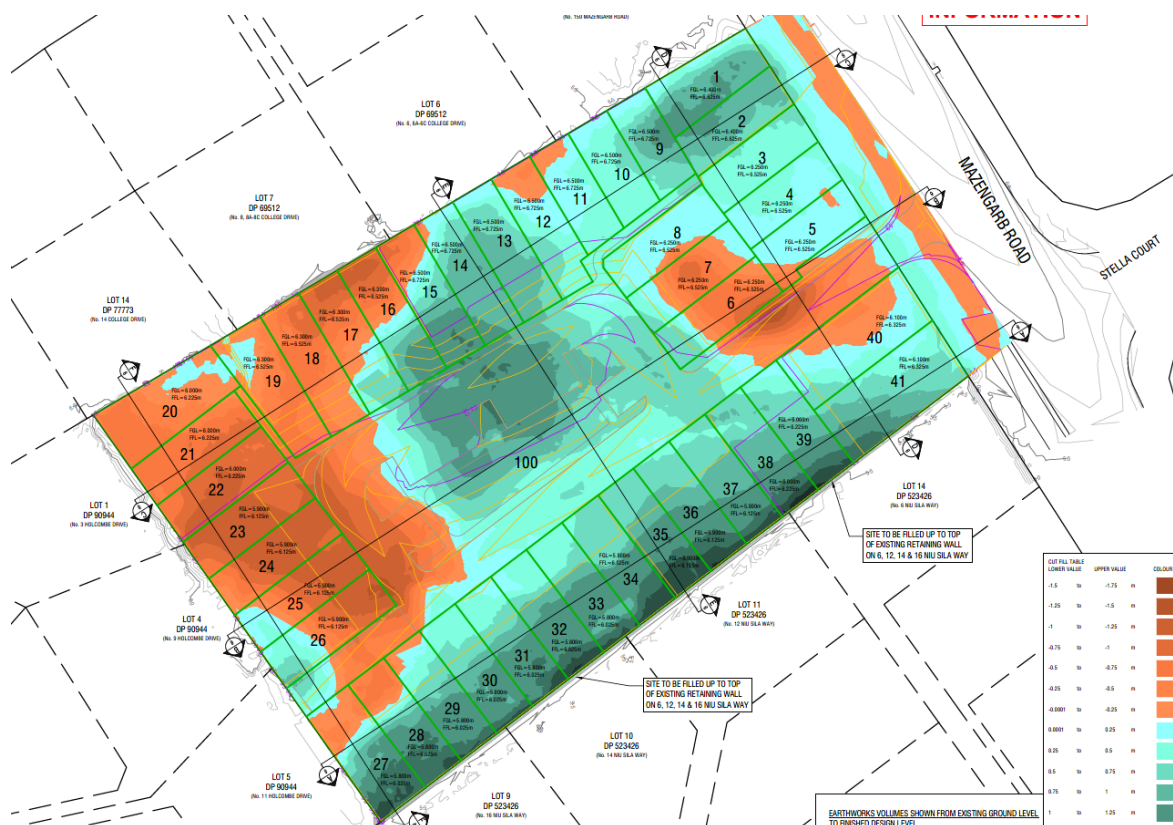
Proposed earthworks showing cut (orange) and fill (green). (Refer to Appendix D for further detail)
